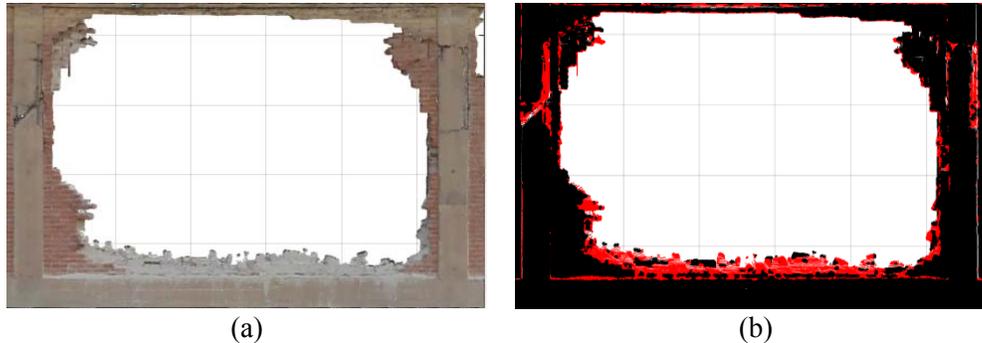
Single bay of second floor at the west wall of the building after the test: (a) the colored point cloud and (b) detected damage shown by red (grey in black and white prints) color.
